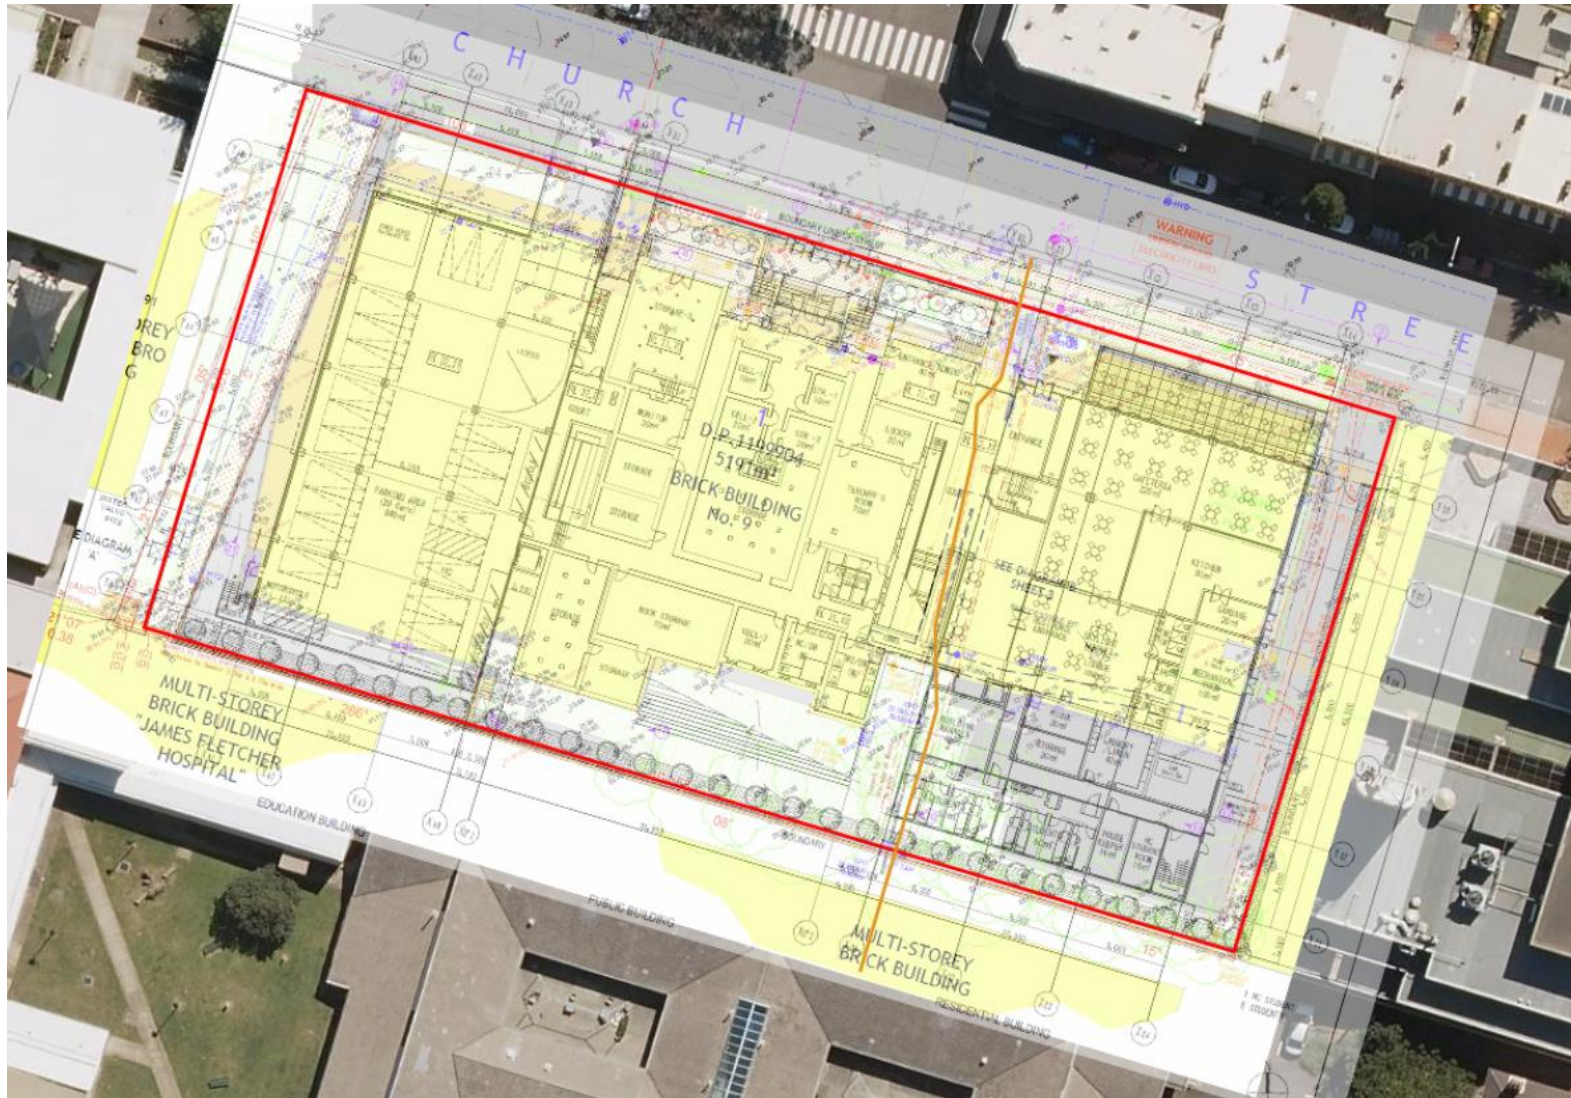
Overlay showing current building survey footprint (yellow) and the location of the post-1861 culvert (orange line) overlaid with the proposed ground floor plan.
